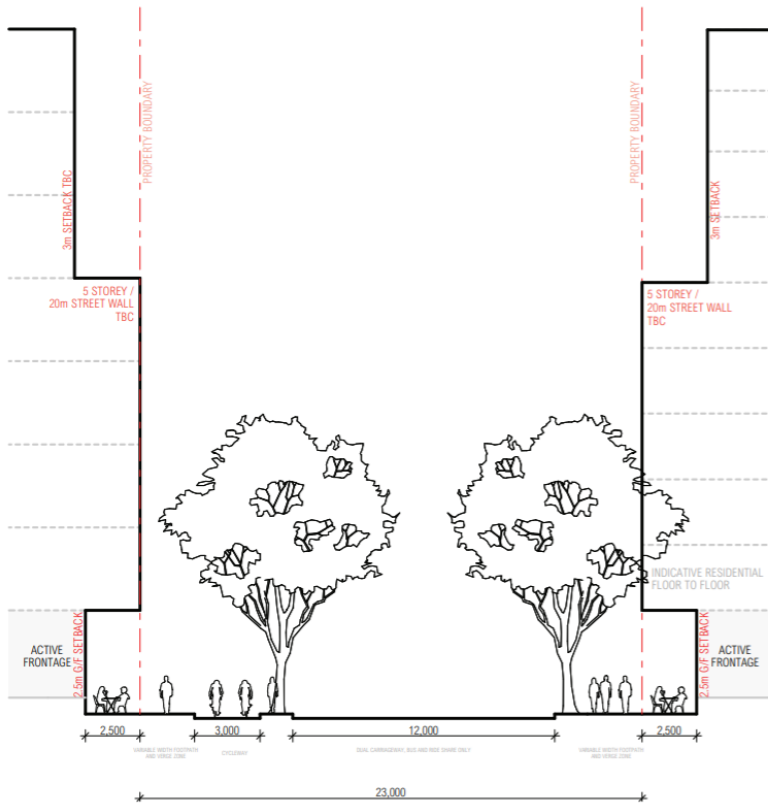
Indicative street section – Ashmore Connector West, North Alexandria
